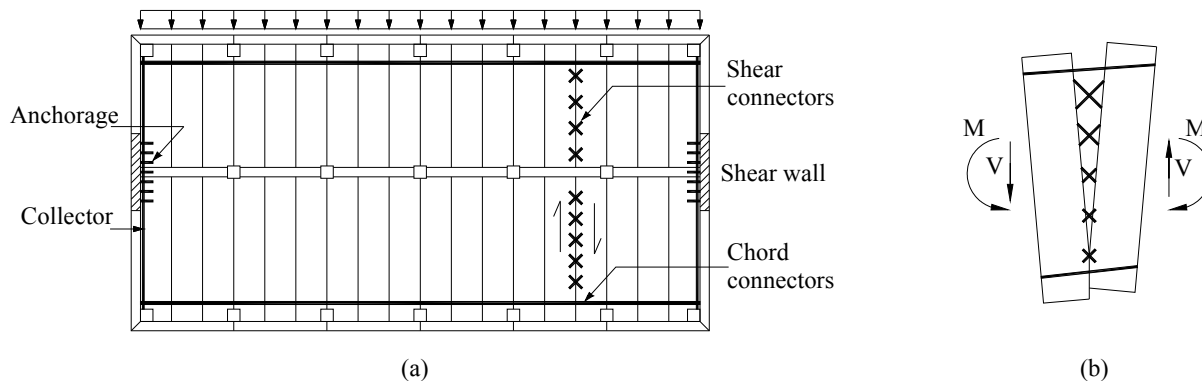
Typical precast diaphragm: (a) plan; (b) combined forces on precast units.
